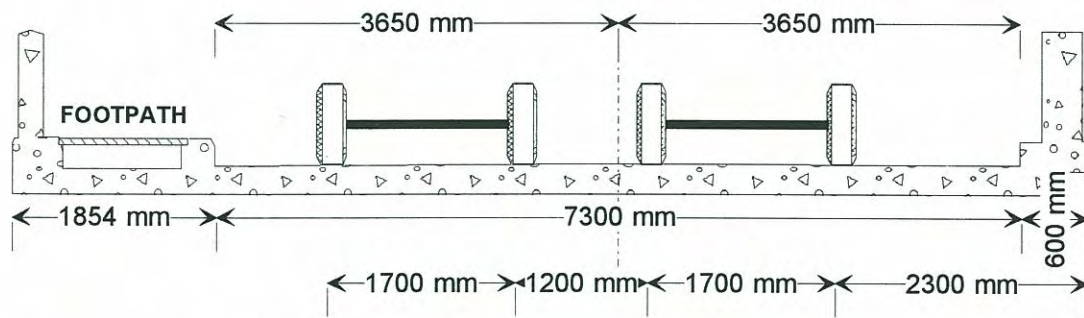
Cross section (looking north) of the bridge structure showing lateral position of vehicles in each lane.
